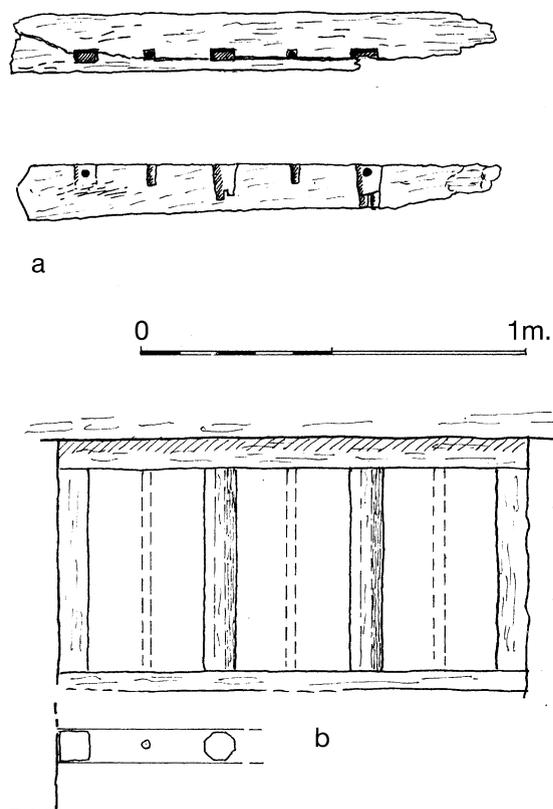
Steel, 'The Tenement'. Details of timber windows (1:20).
